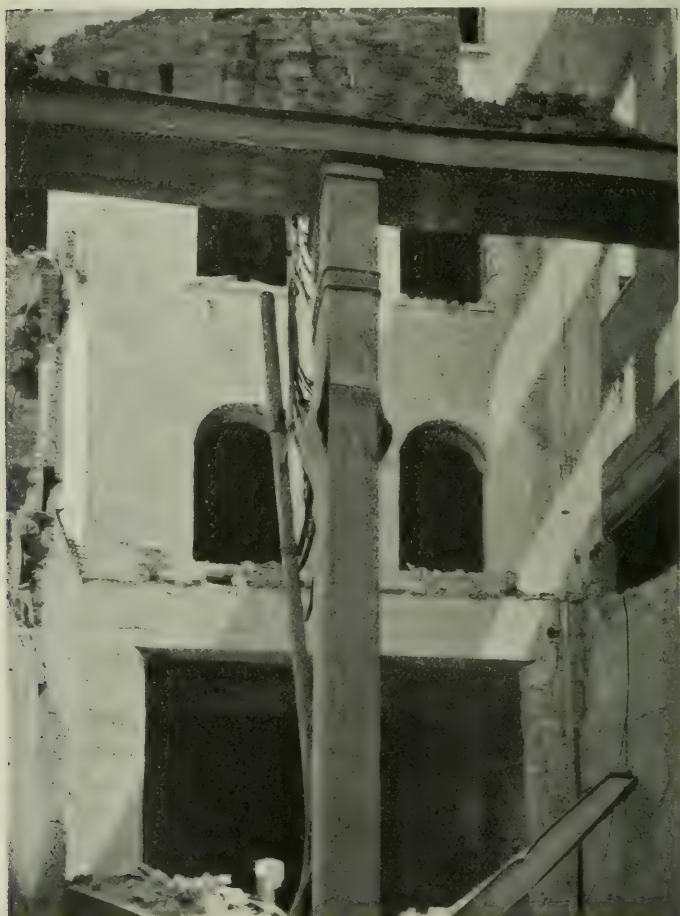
Academy of Sciences Building, San Francisco. Complete Failure of Cast Iron Shell. Concrete Core Carrying Load on Column.
